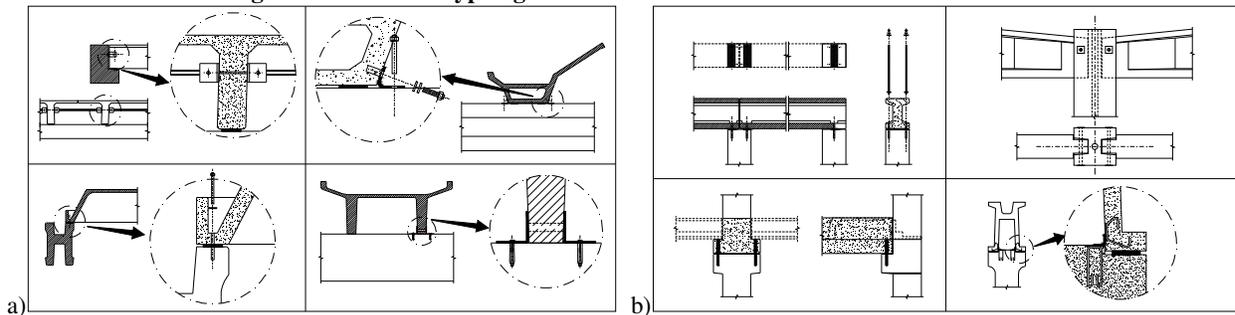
a) Roof element-to-beam connections; b) Beam-to-column connections
